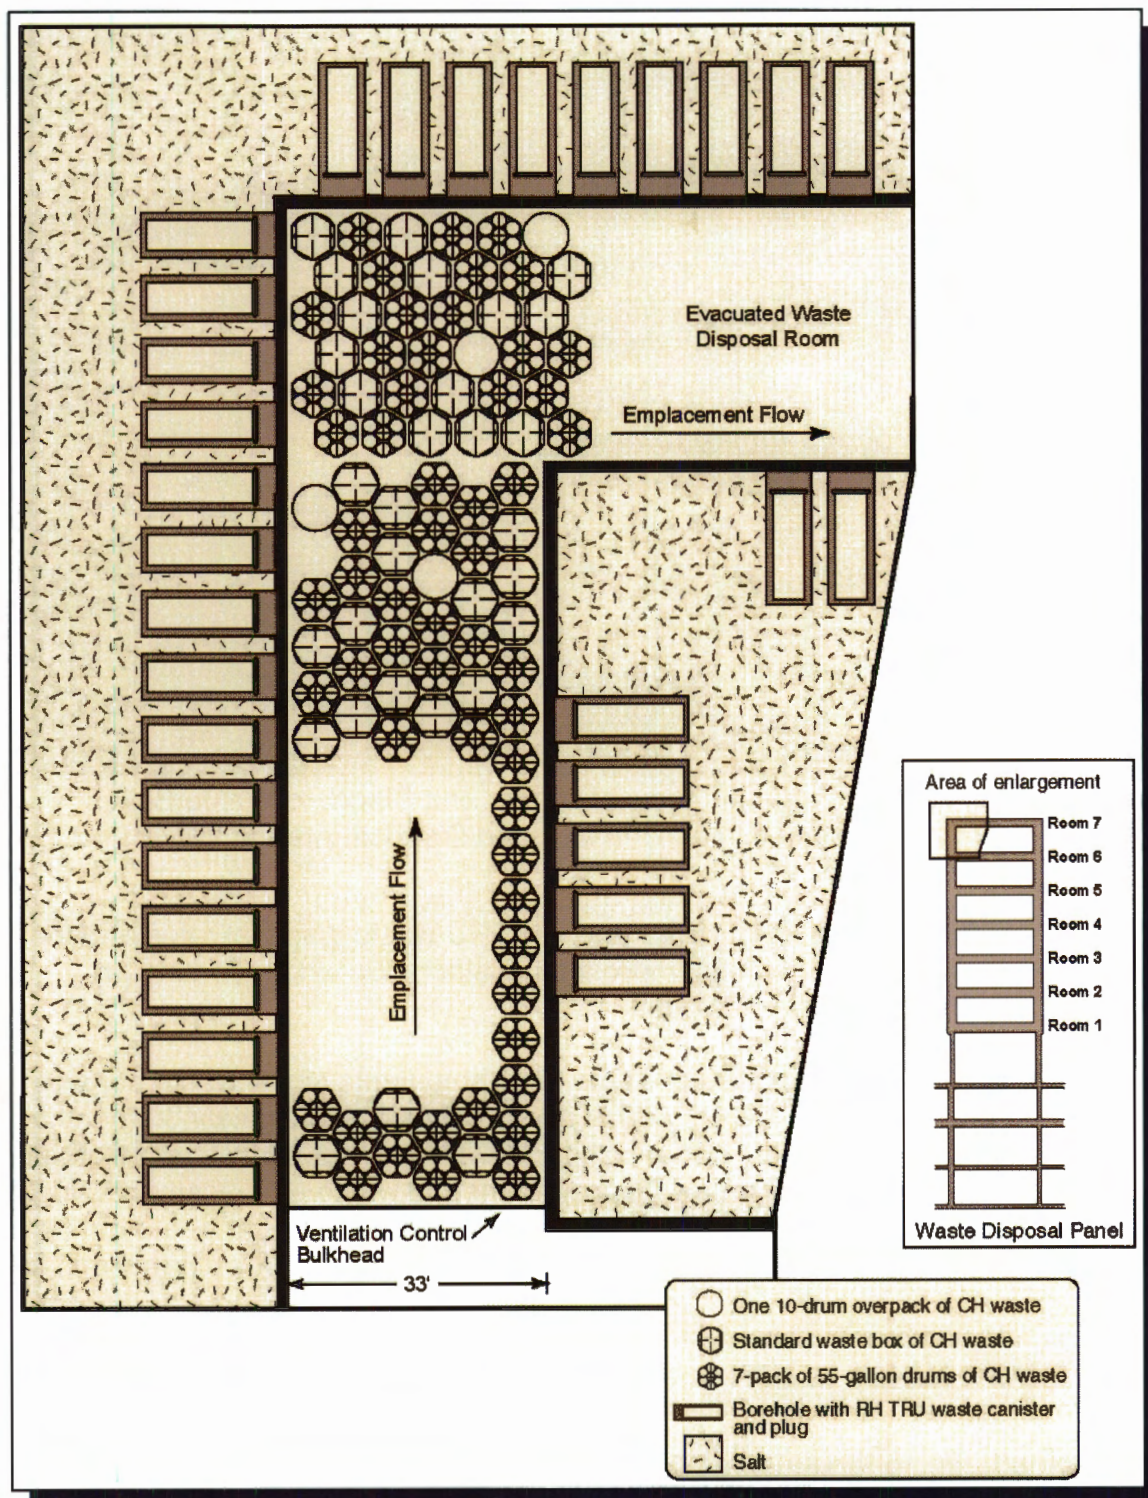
Plan View of a Section of a Typical Underground Disposal Area Showing CH TRU and RH TRU Waste Emplacement
